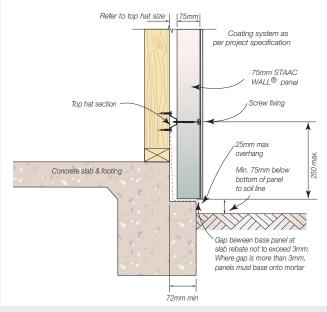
Junction to shallow concrete edge beam (Achieves FRL 180/180/180 when installed as part of the wall system. See Section 10)
